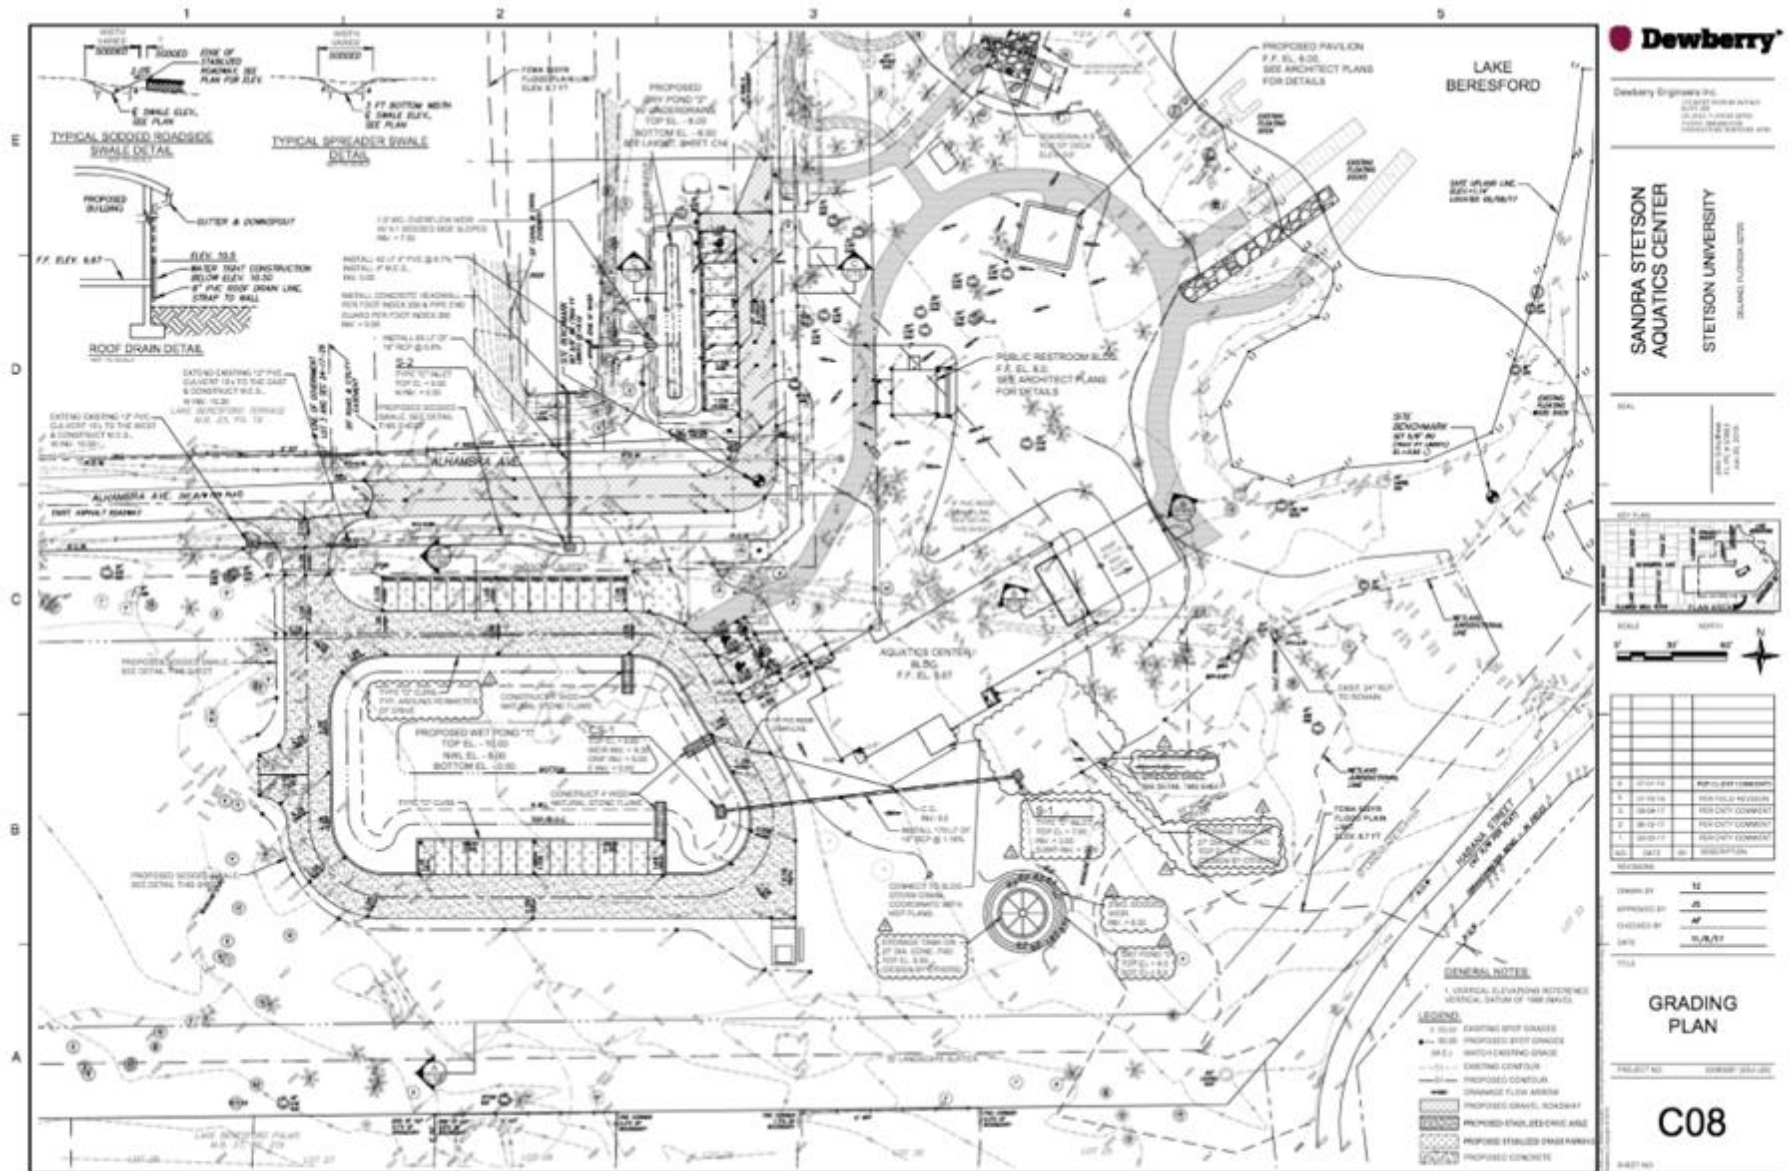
Original Site Geometry Bid Plan (with Rain Garden), Sandra Stetson Aquatic Center
